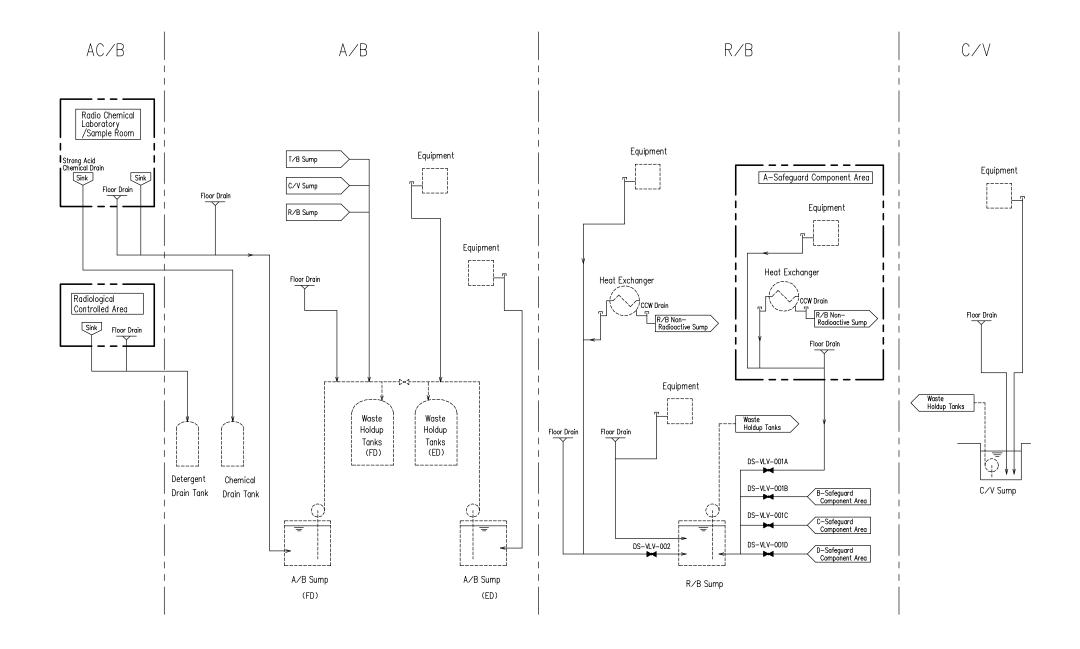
Equipment and Floor Drain System Flow Schematic (Sheet 1 of 2)
